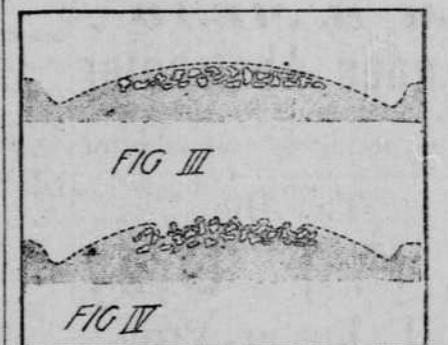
Cross section of road, showing lumps of clay placed on a sand subsoil and covered with sand.
